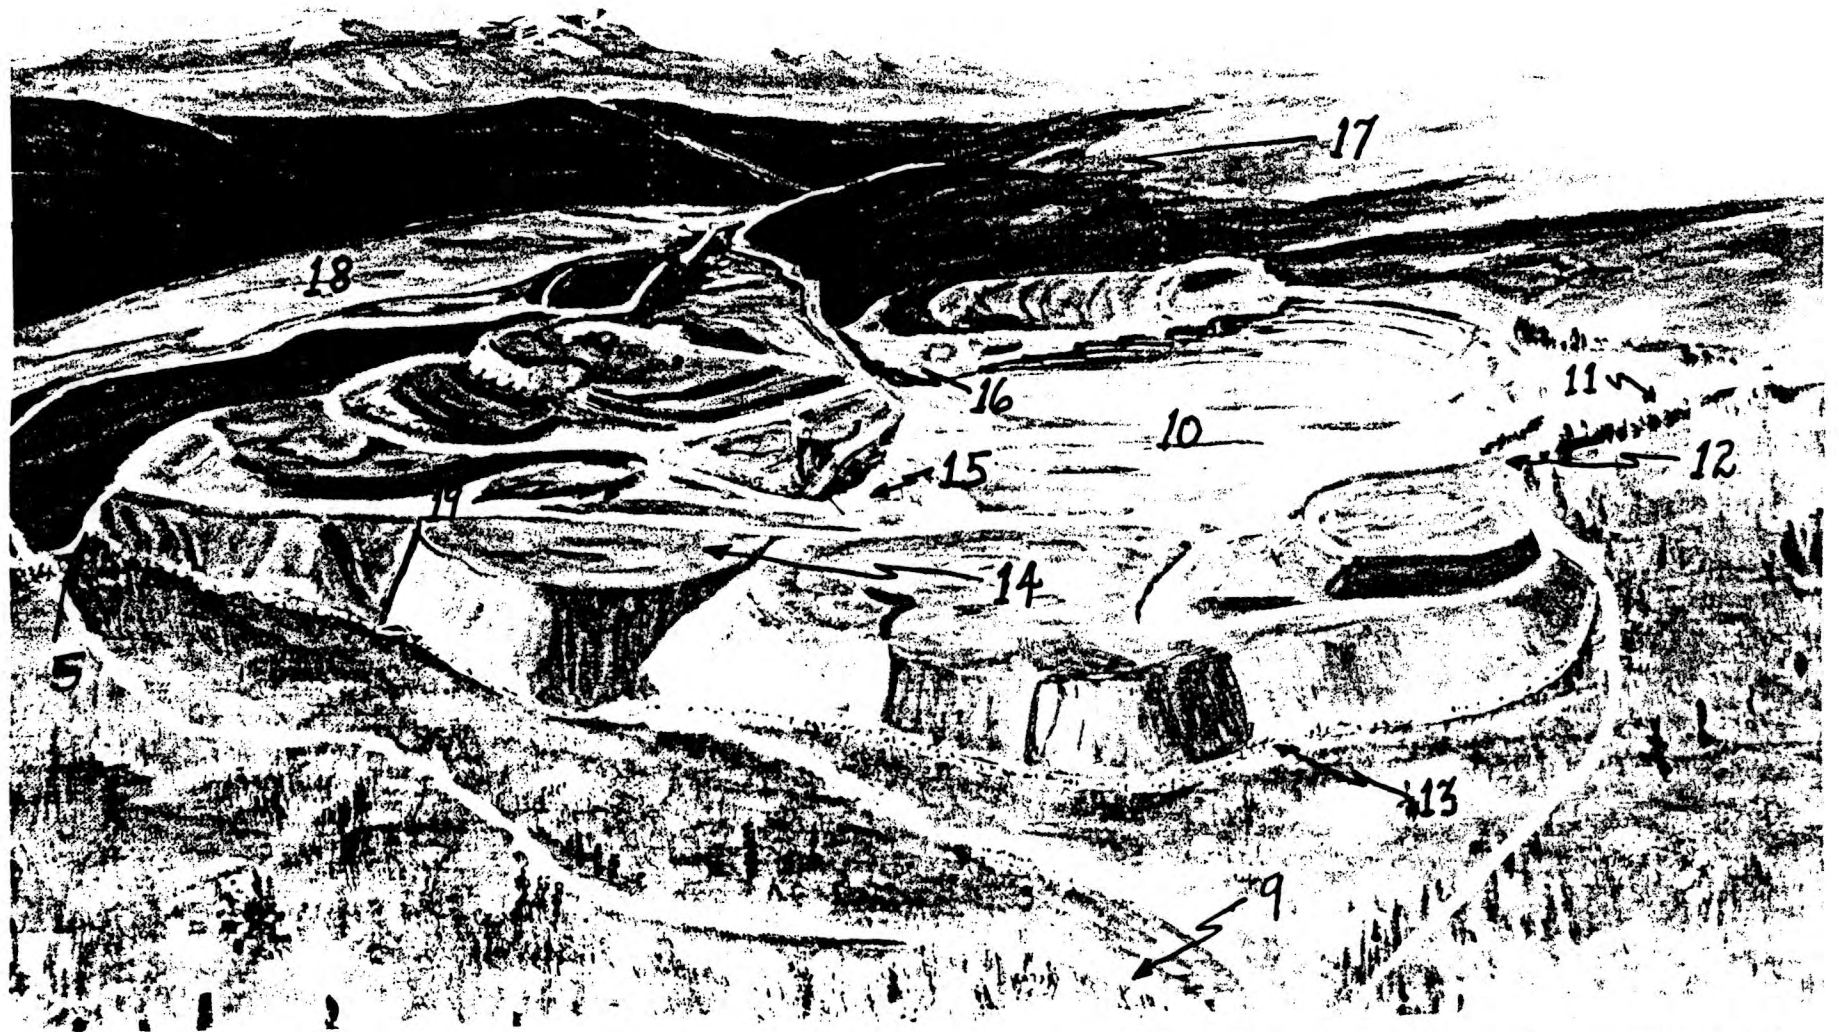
FARO MINE SITE - POST DECOMMISSIONING - Faro Lake is shown at its final water elevation with tailings deposited below water surface (year 2026). Faro Creek is permanently diverted into the lake over the pit wall and its outflow is directed to Rose Creek. The Plug Dam prohibits surface flow and restricts seepage to the Zone II Pit. The North Fork of Rose Creek flows through a partial breach in the Vangorda Plateau Haul Road, joins the South Fork and enters the Valley Lake. The Rose Creek Diversion is removed. The Mill, other buildings and facilities are dismantled and the area revegetated with grass/legume cover crop. The Waste Rock Dumps and area around the Rose Creek Tailings Area are also revegetated.
